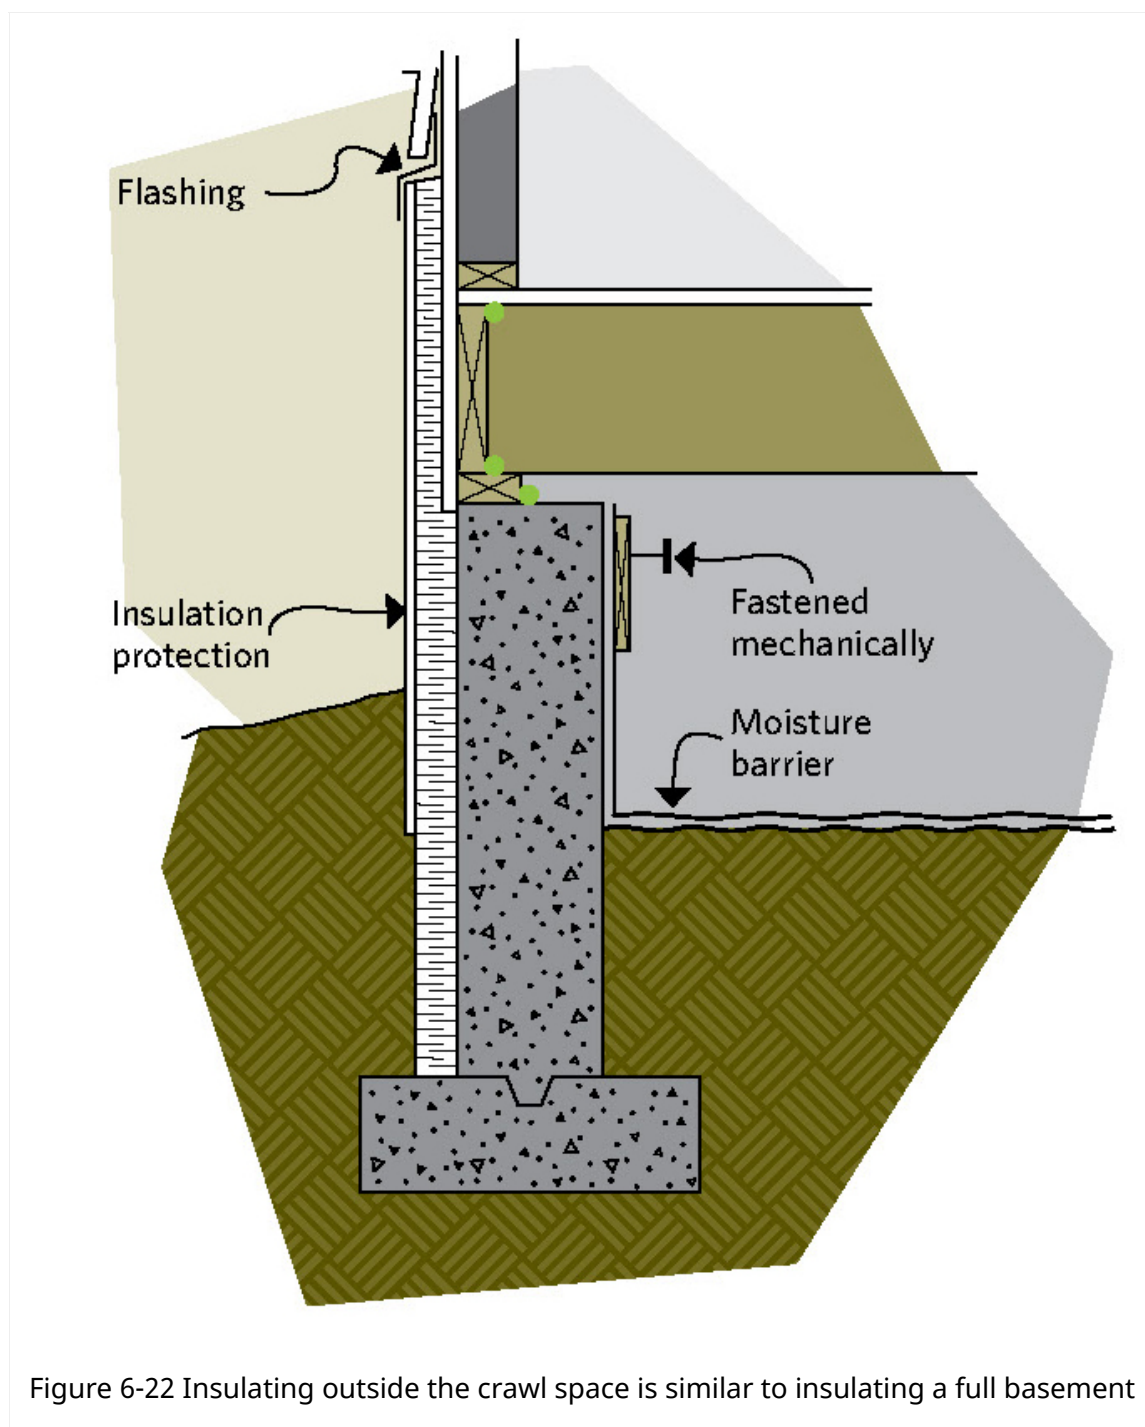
Insulating outside the crawl space is similar to insulating a full basement
